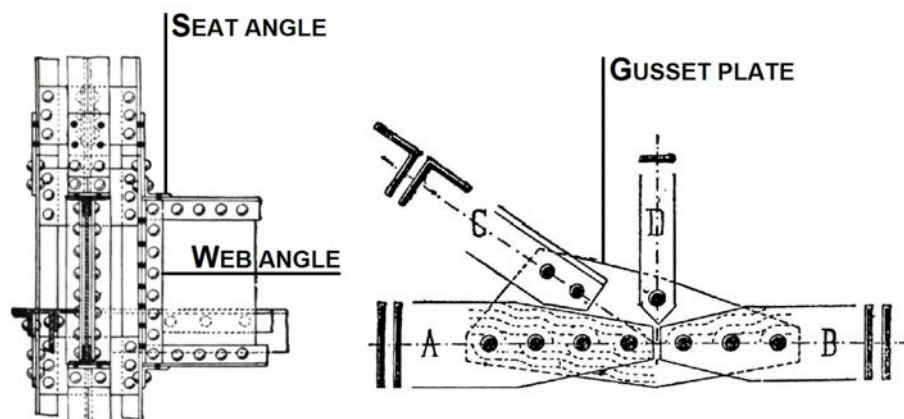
Beam-to-column (left) and trusswork connections (right) are two assembly-type applications of rivets (Freitag 1904, 215; Dechamps 1888, fig. 86)
